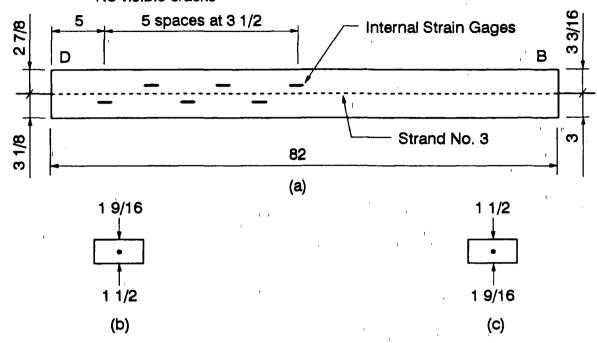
Specimen No. 17-3.0TC-7 (dimensions shown in inches):
